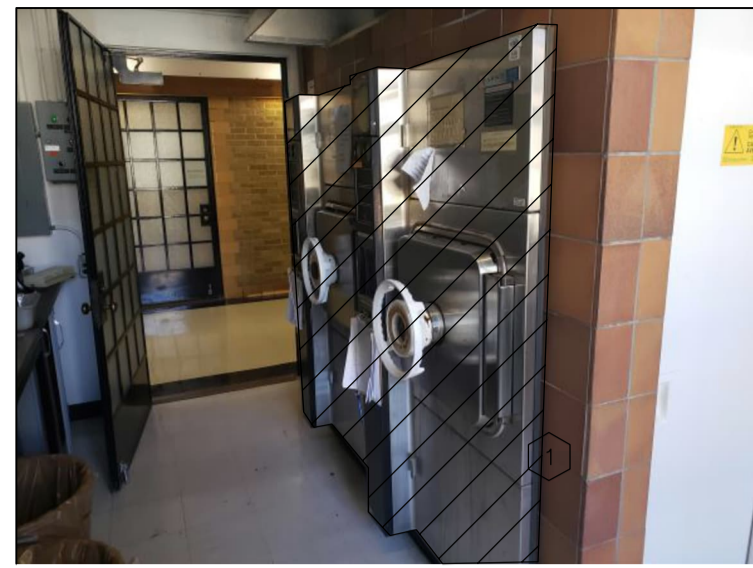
EXISTING AUTOCLAVES AND PIPING REMOVAL (1)
